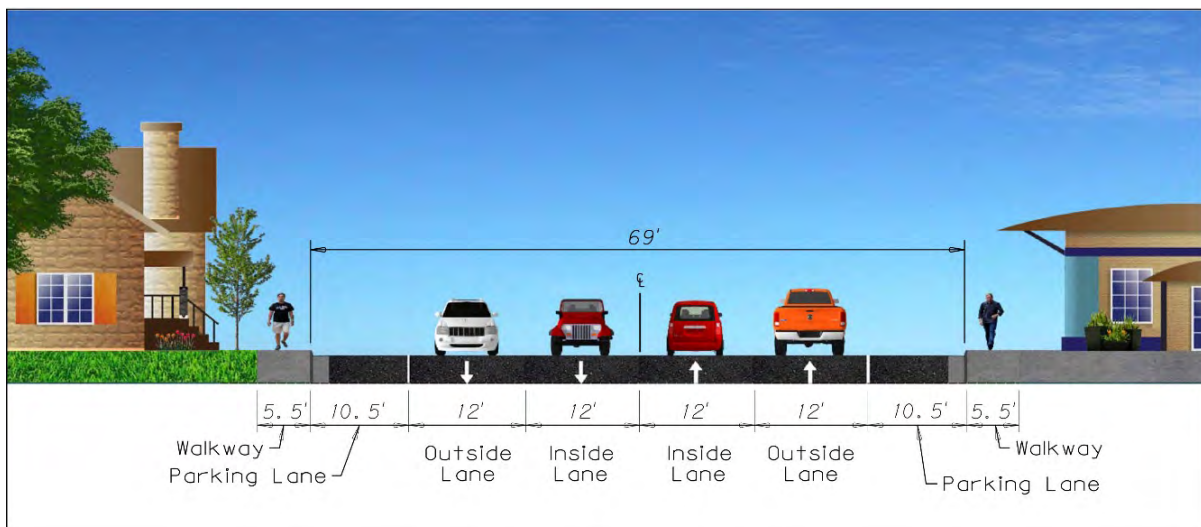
Existing Four Lane Typical Section (Borden to North of High School)
